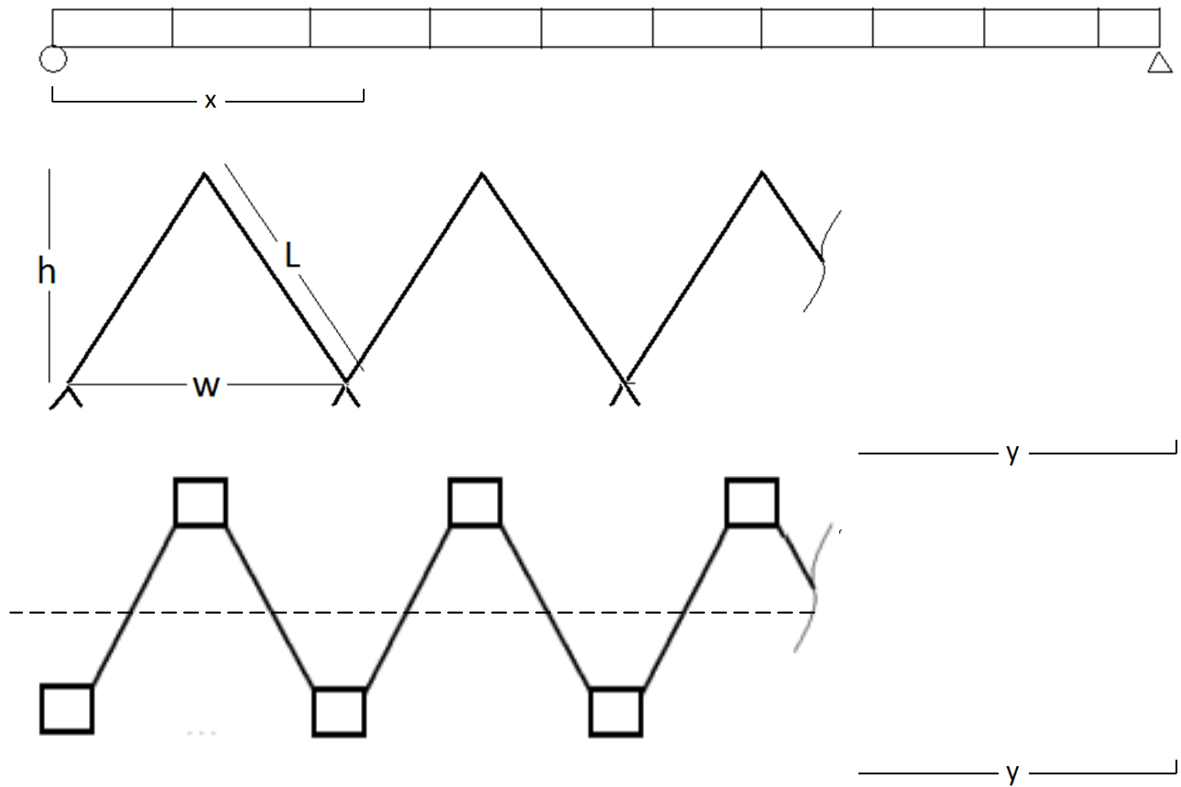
(continued): A folded plate roof, with approximations of structural behavior.
